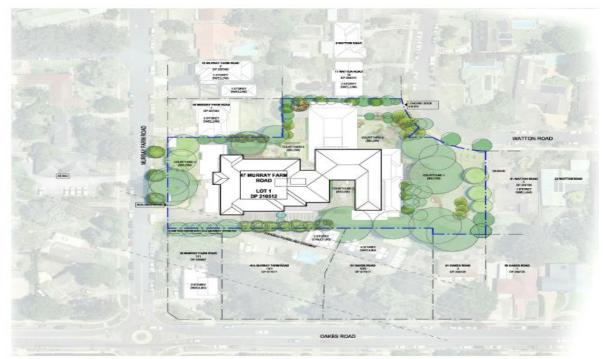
Proposed Site Plan. Source Thompson Adsett Architects
